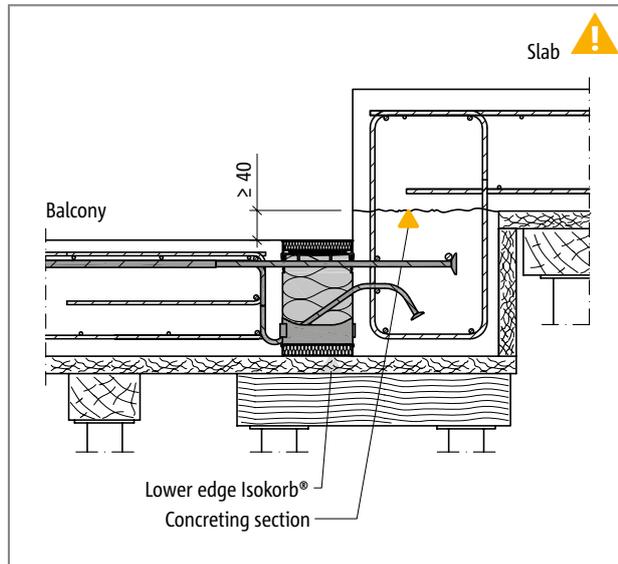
Schöck Isokorb® XT type K-U: In-situ concrete balcony with height offset downwards
